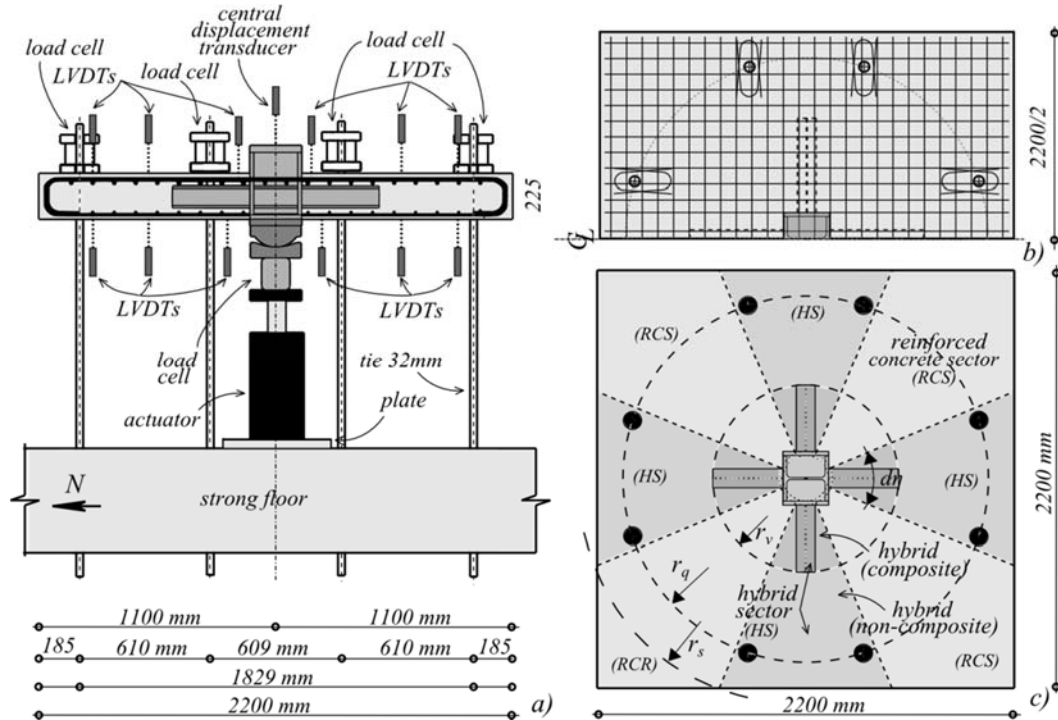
General layout of hybrid members a) test setup, b) reinforcement layout, c) layout of sectors
